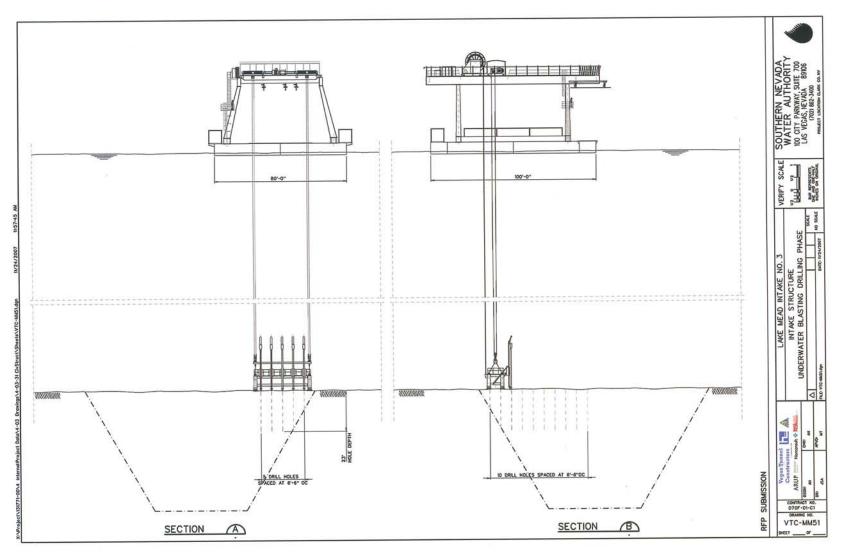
The drill and blast excavation, as outlined in the proposal documents, was considered but not selected because shaped charges were deemed more reliable on the expected steep, varied topography.
